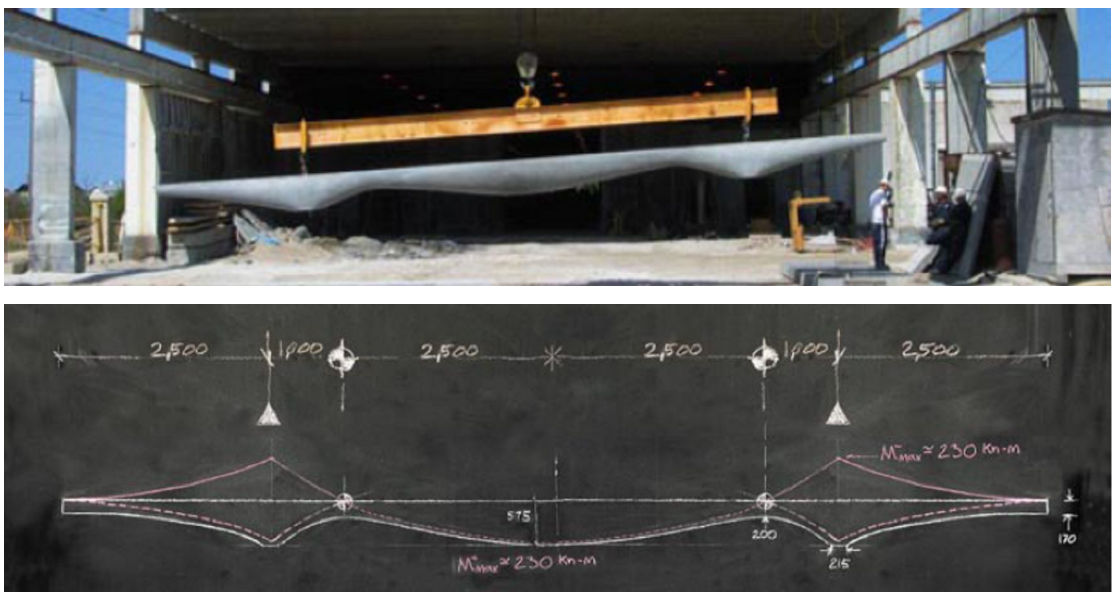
12m long fabric formed beams cast at C.A.S.T
